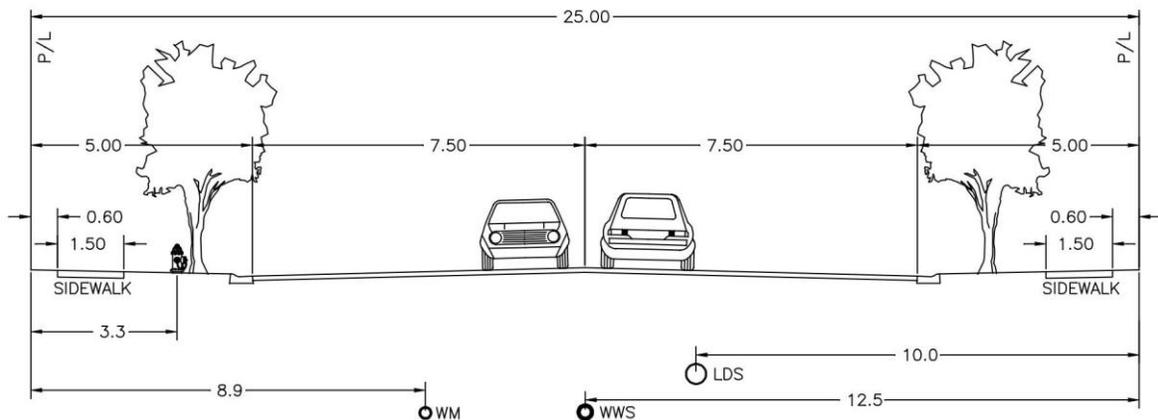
NORTH-SOUTH COLLECTOR STREET
